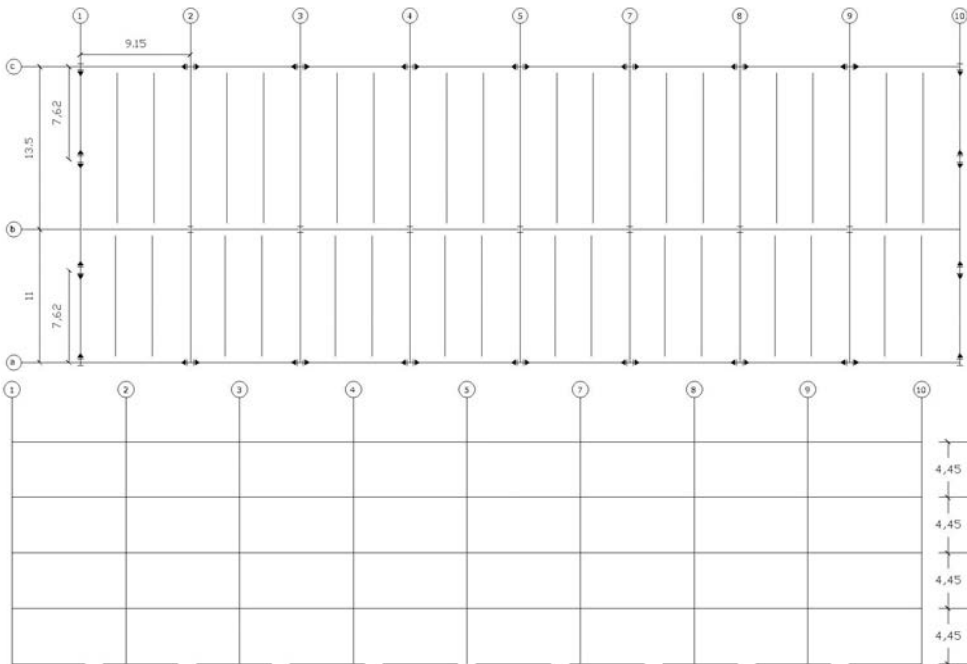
Plan and elevation of a typical four-story steel frame facility in a non-seismic region.
